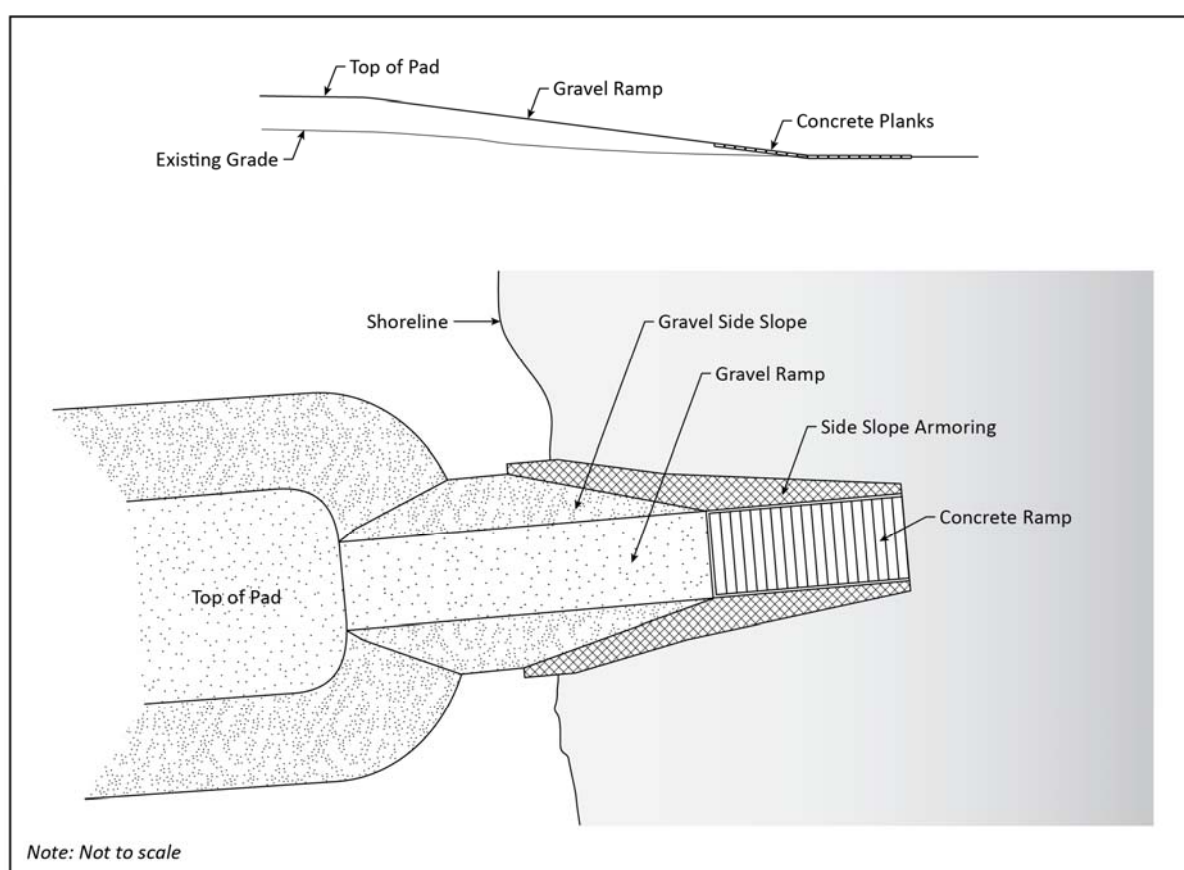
Emergency Boat Launch Ramp Example Drawing
